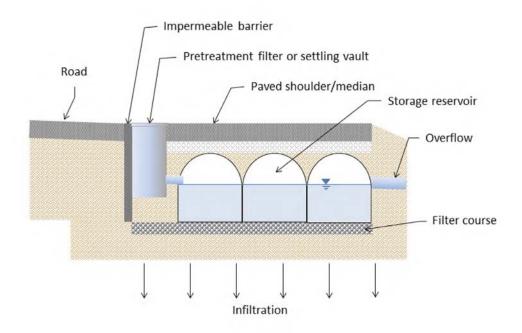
Cross-section view (example of arch gallery sited in breakdown lane).
